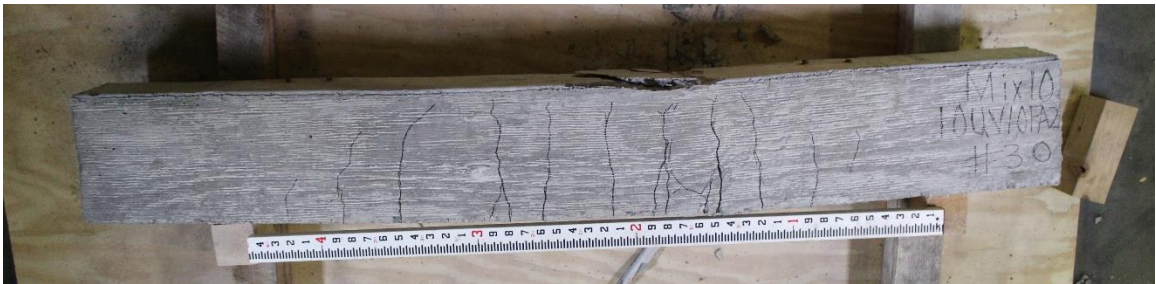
Mixture 10 (10UV10FA2) beam #30: concrete beam side view.
